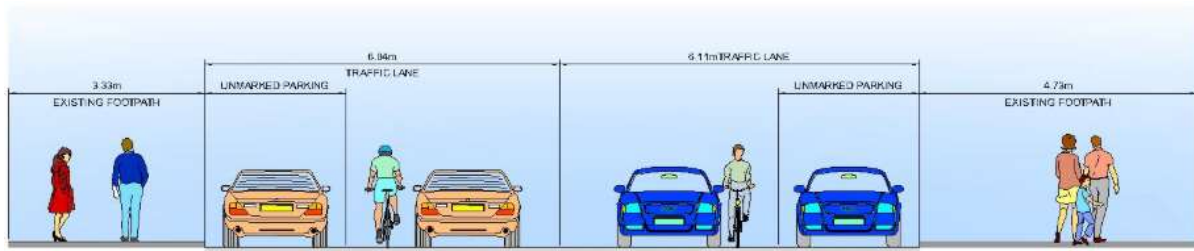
Existing layout Cross Section at Seapoint Promenade– Two-way traffic system
